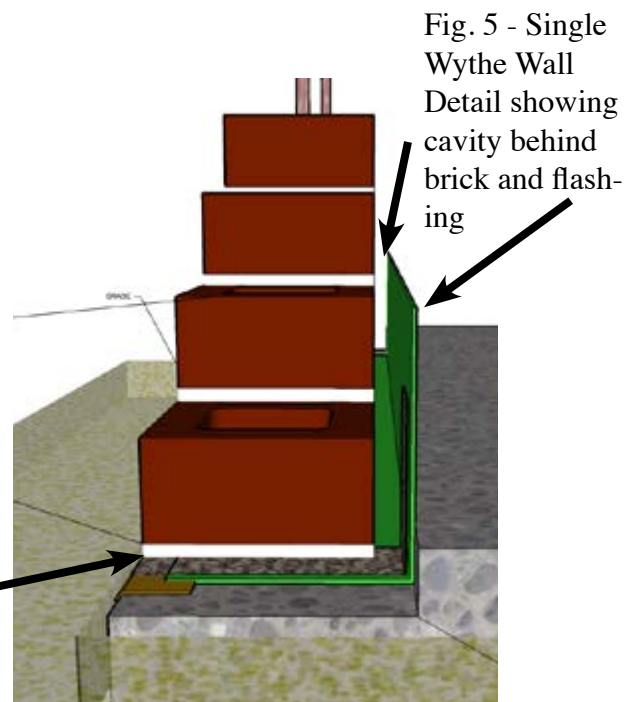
Single Wythe Wall Detail showing cavity behind brick and flashing
